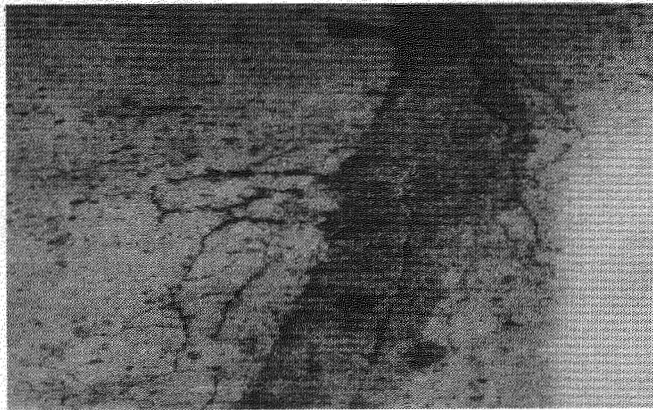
A Photo Showing Finer Crosswise Cracks in the Asphalt Pavement
